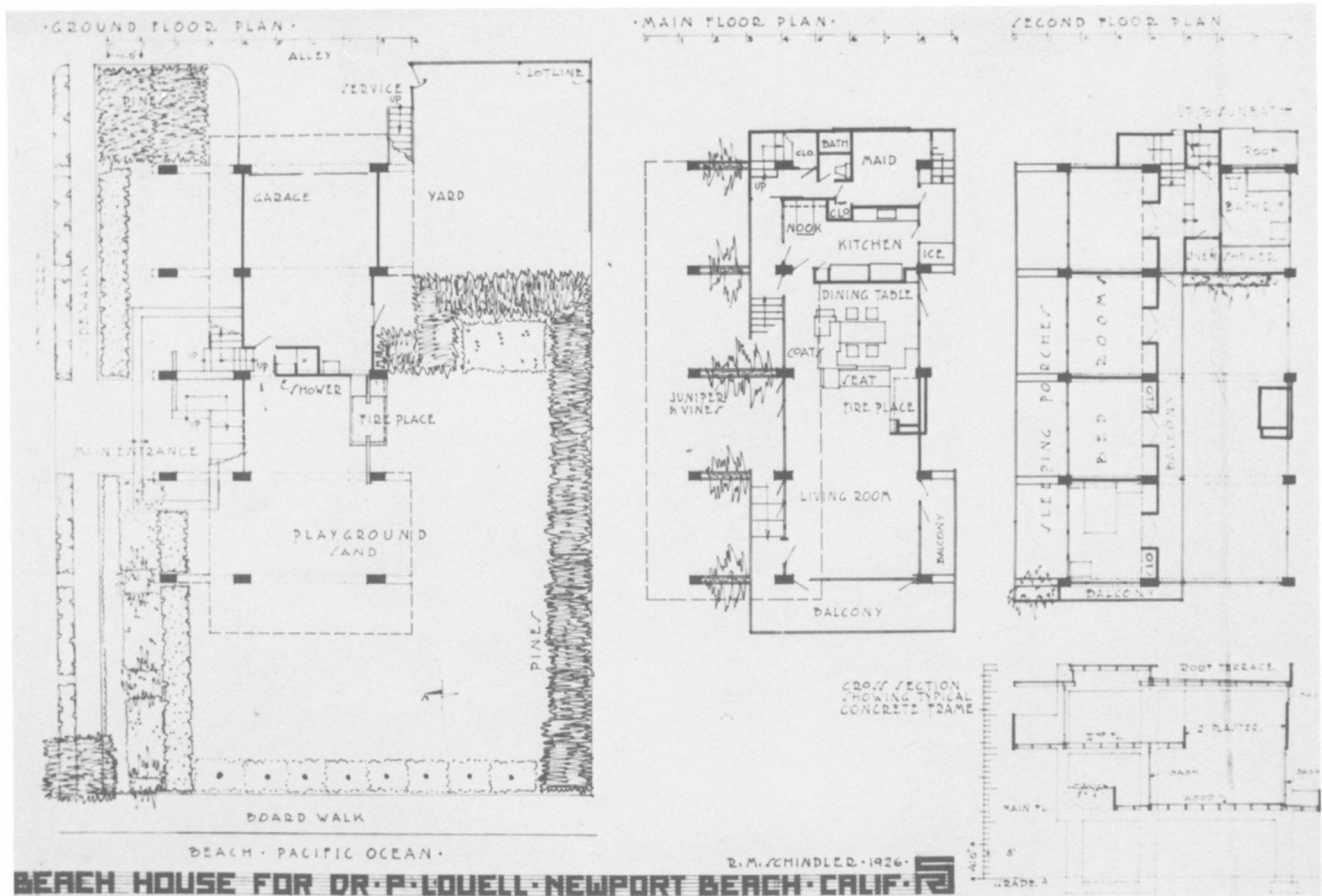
Schindler, Beach House, floor plans and section, 1926 (UCSB-ADC).
